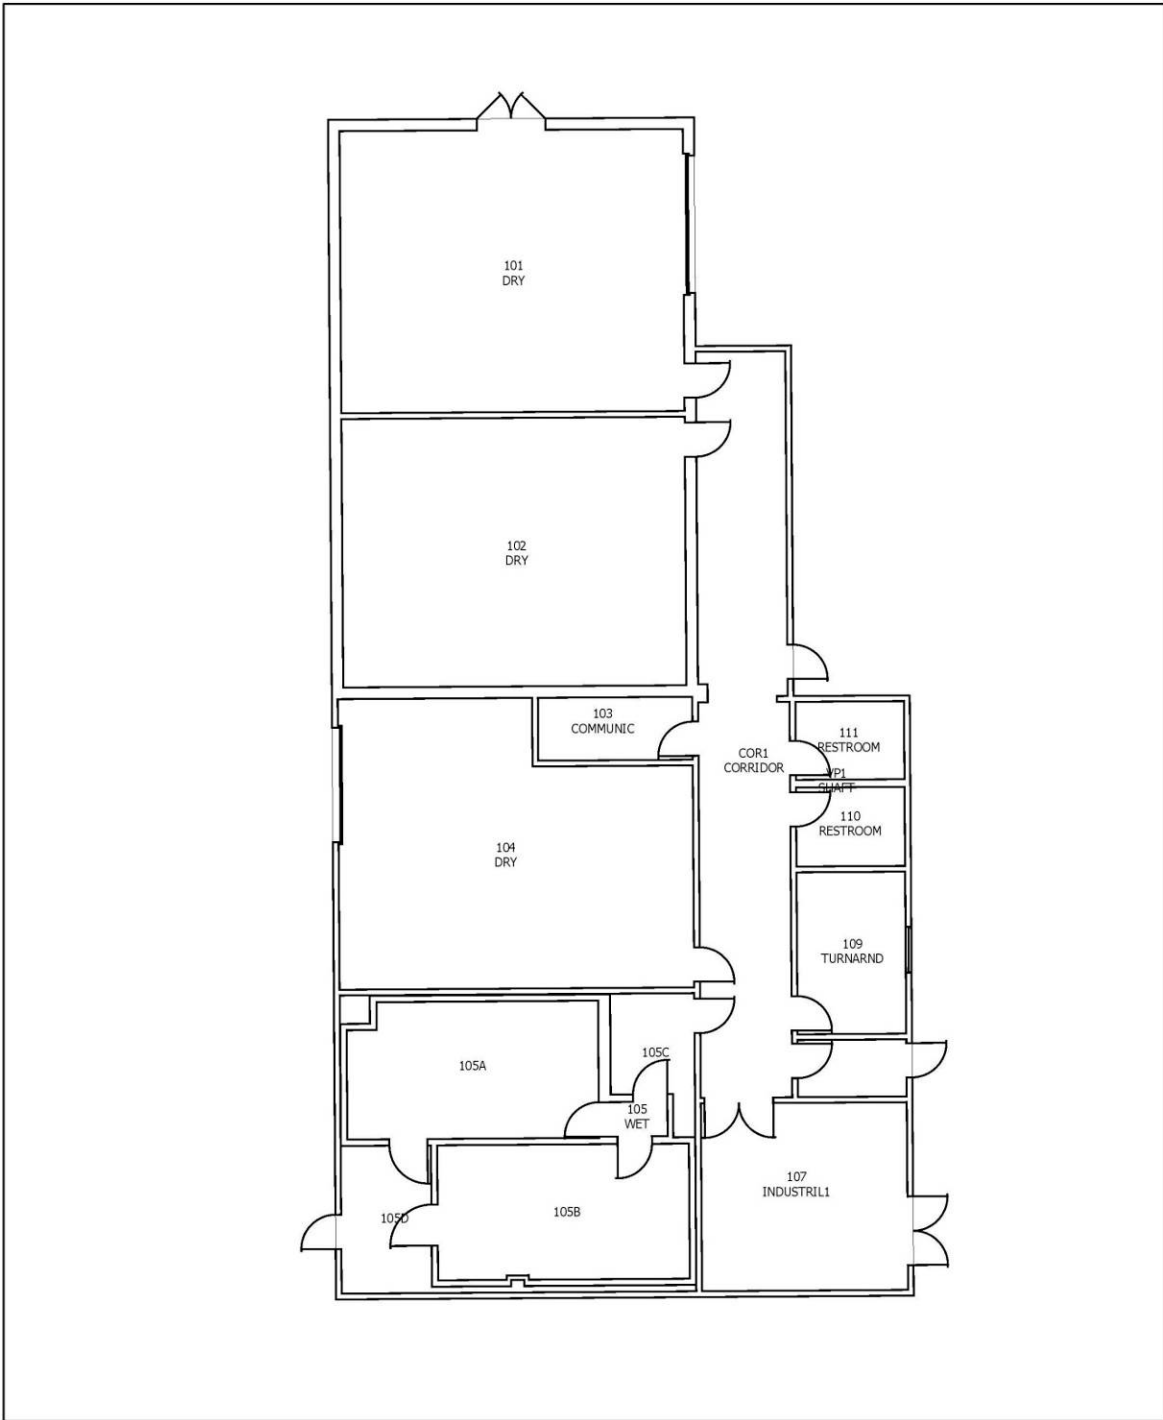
IRC Laboratory Building (IF-603) floor plan (3rd floor).
